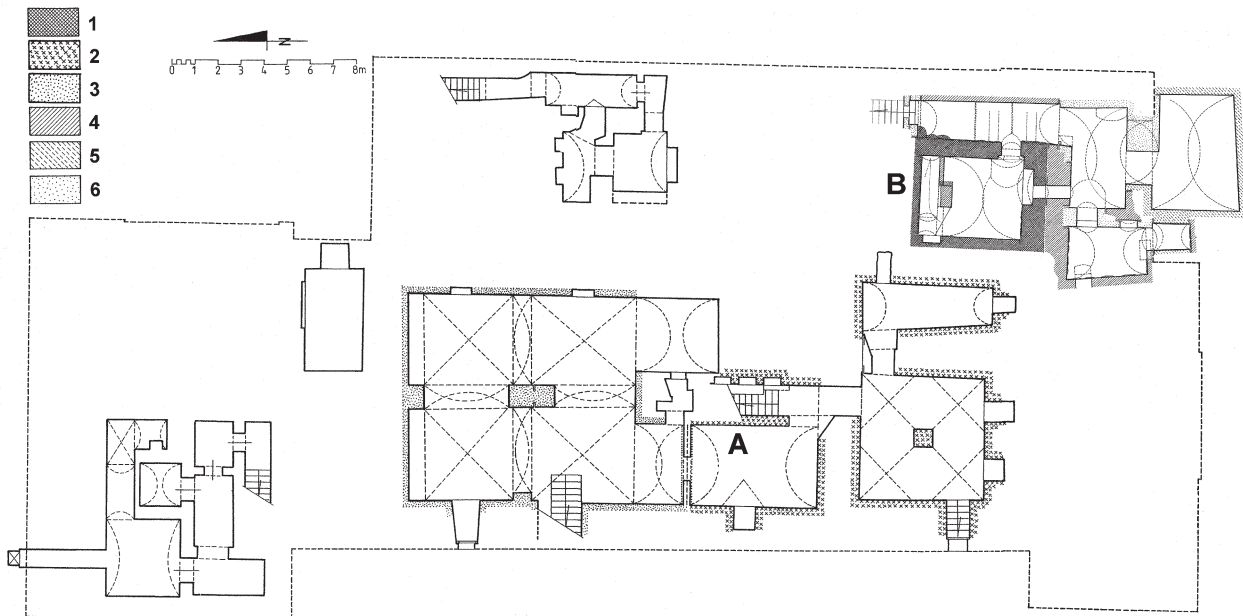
Plan of basements of the middle wing of the town hall and old burgher townhouses with layers of the examined walls: 1) walls from the 15th century, 2) walls from the 1540s, 3) walls from the 1660s–1670s, 4) walls from the 17th/18th century, 5) walls from the 18th century, 6) walls from the end of the 19th century, A) basements of the first town hall building, B) basement of the chamber-shop in the commercial building (by J. Burnita, C. Lasota, A. Legendziewicz)
